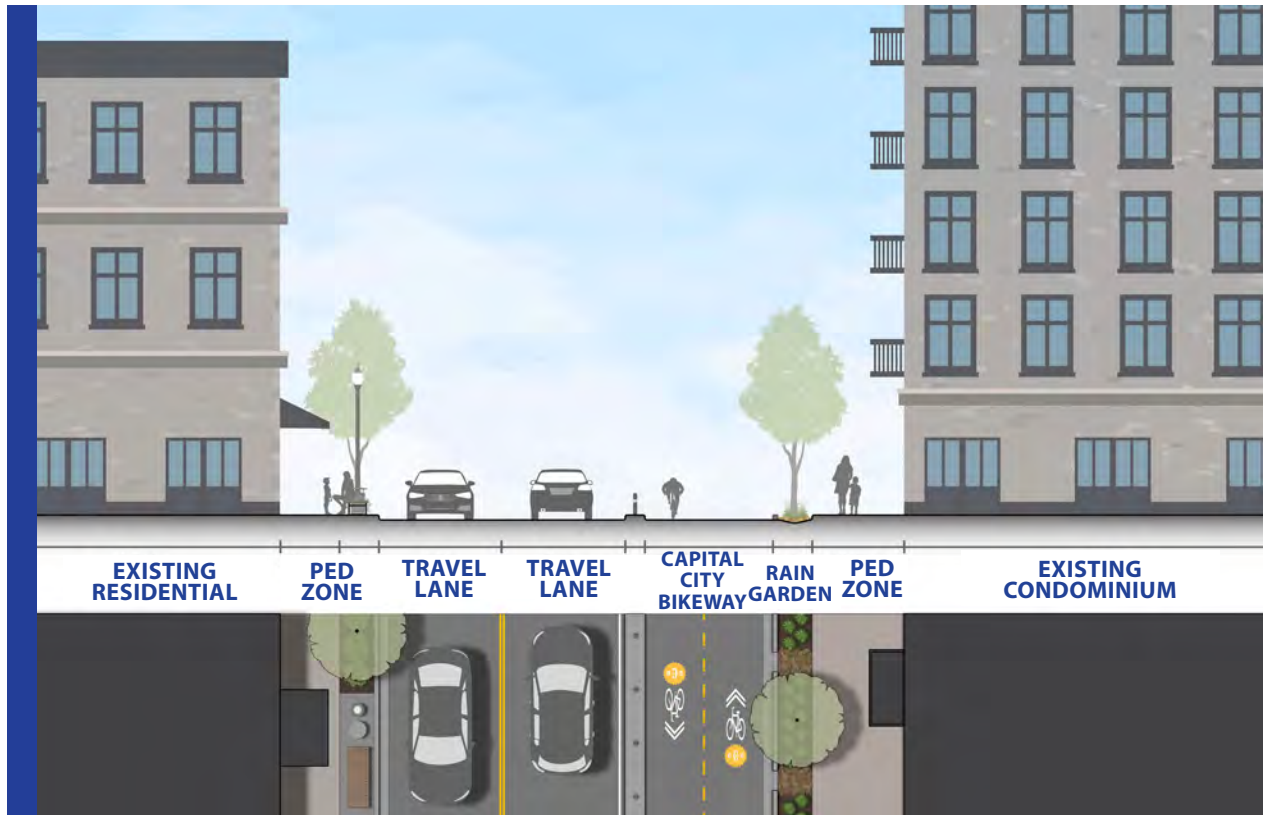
10th St Street Example Cross Section - West of Cedar St.
